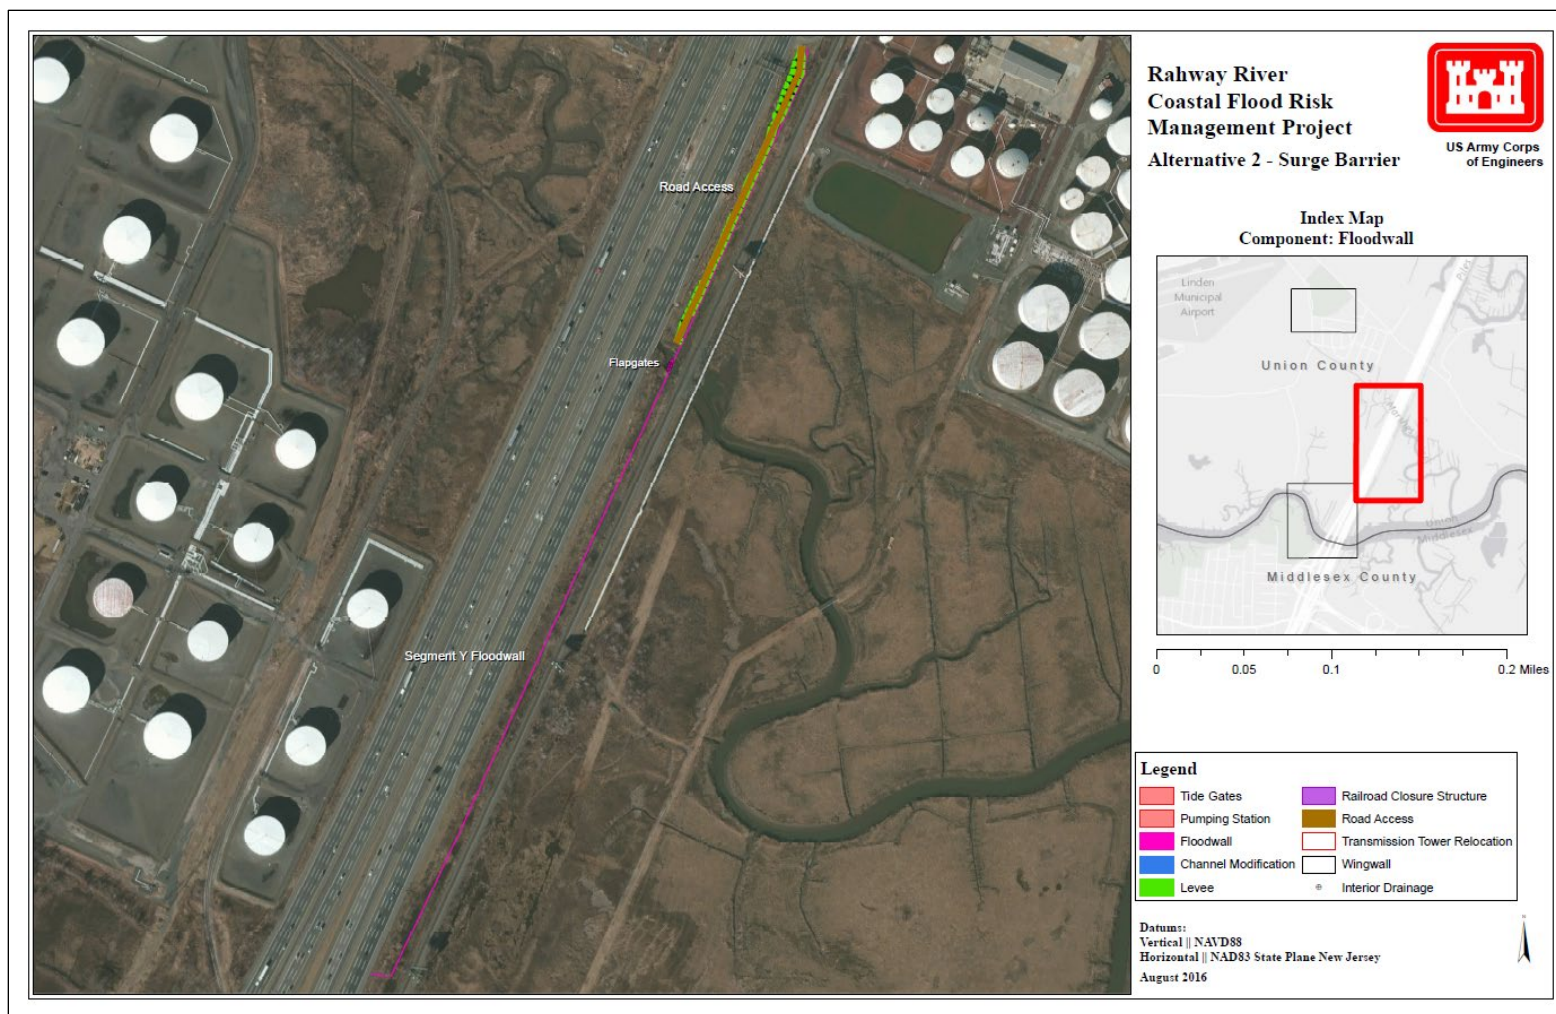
Alternative #2 Floodwall along Turnpike Northbound layout.
